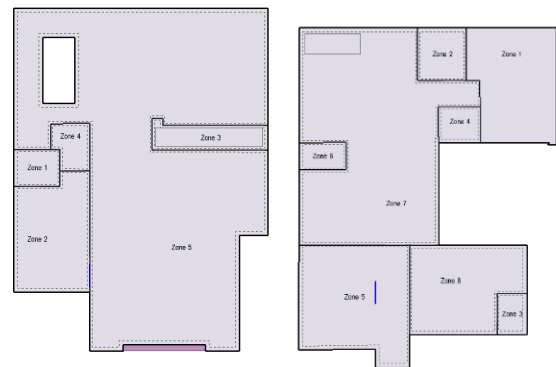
Different zones in ground floor (left) and first floor (right) of the building in Design Builder software
